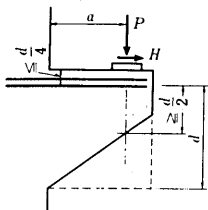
Effective depth and primary tensile reinforcement below the loading position of corbel
